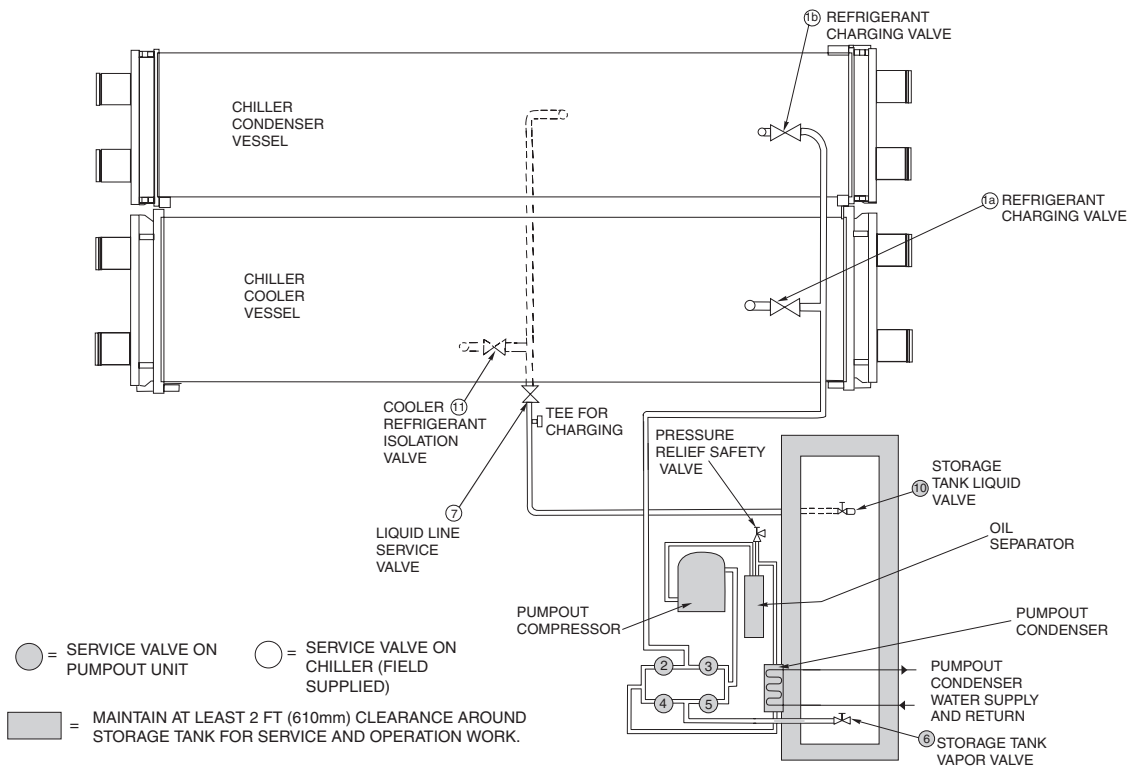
Typical Optional Pumpout System Piping Schematic with Storage Tank
